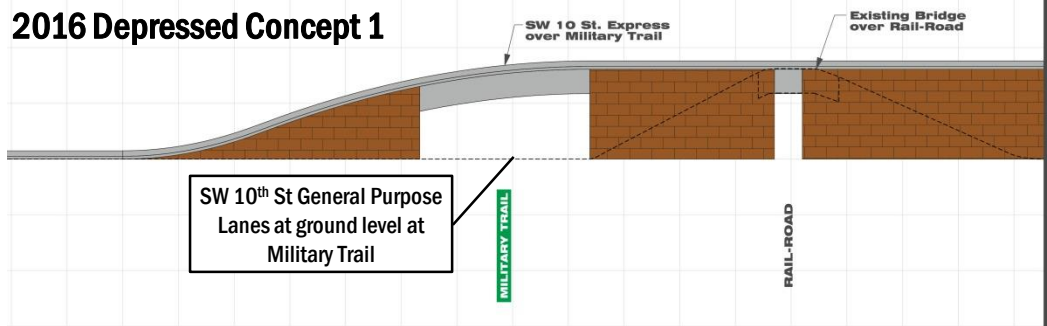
h Street at Military Trail Intersection and the Railroad Crossing
